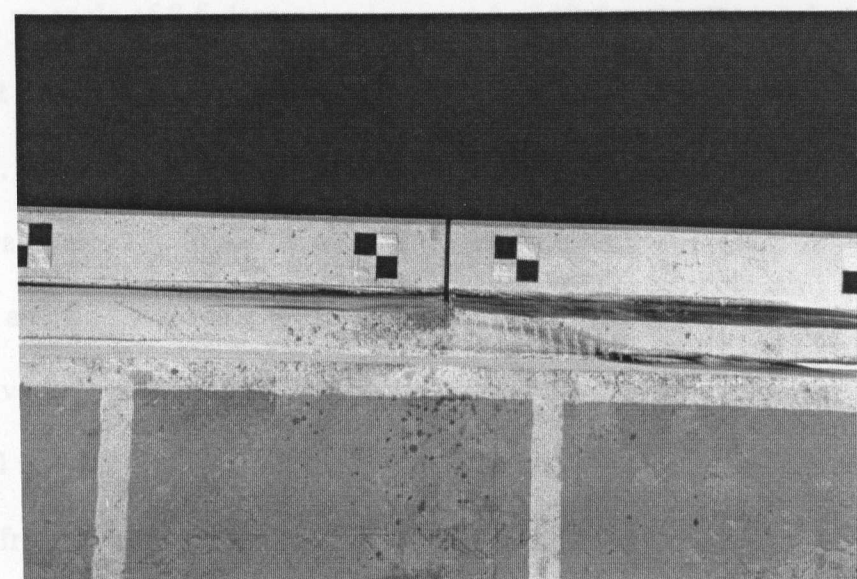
Bridge Rail Damage, Test NTBR-1
